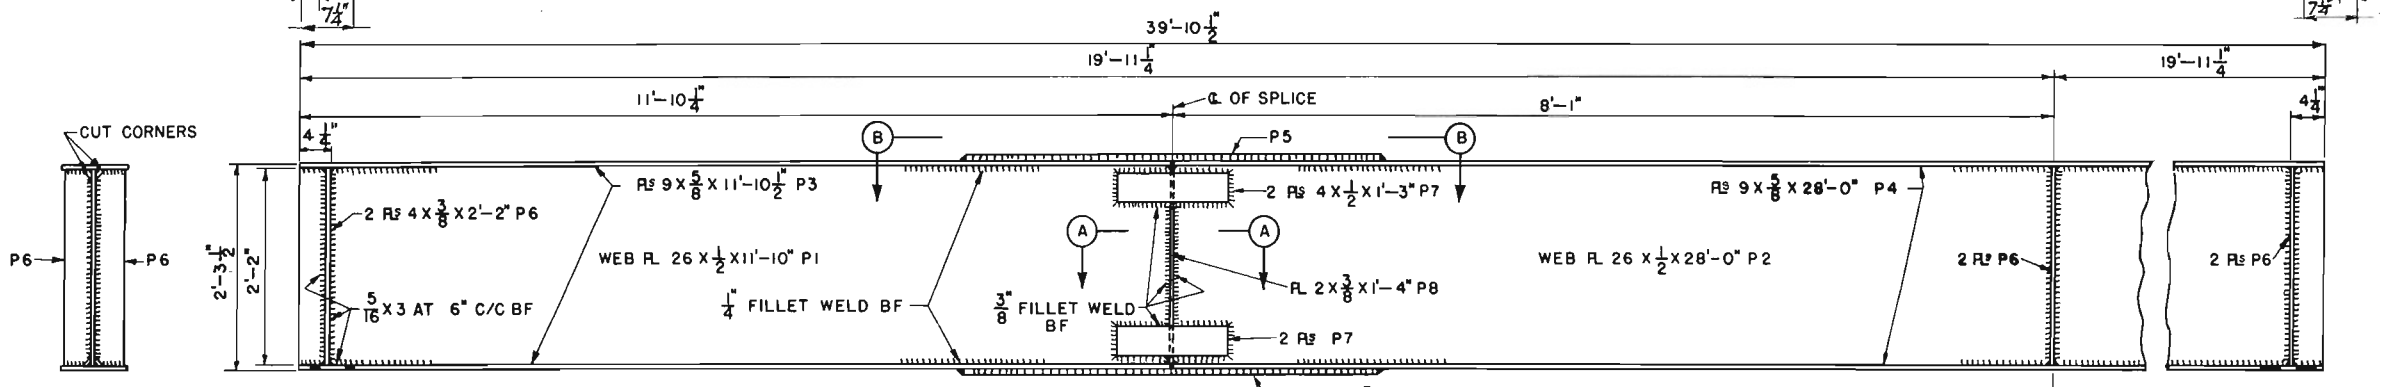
PLATE GIRDER REPLACING 24 I 87 40' SPAN
